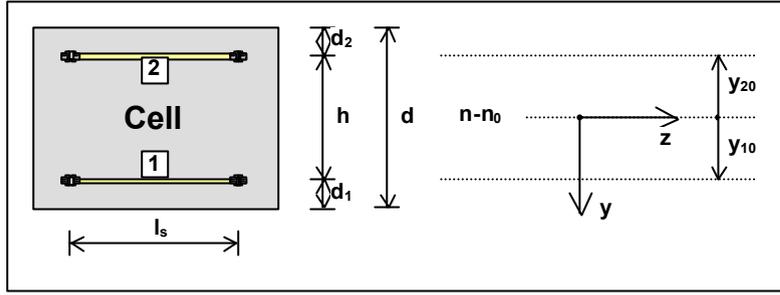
Parallel topology in a segment of non-cracked concrete beam
